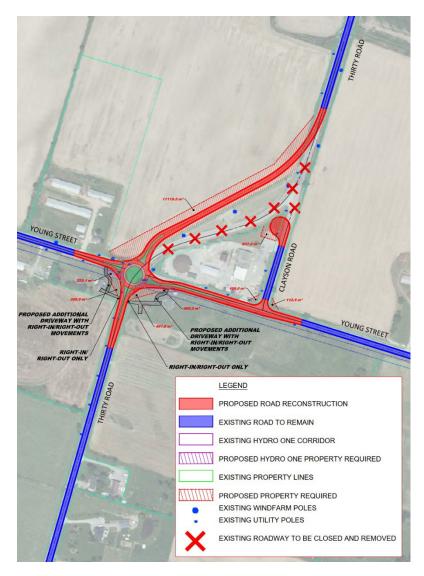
Alternative 4: Roundabout Intersection with Thirty Road Realigned North of the Windfarm Poles
